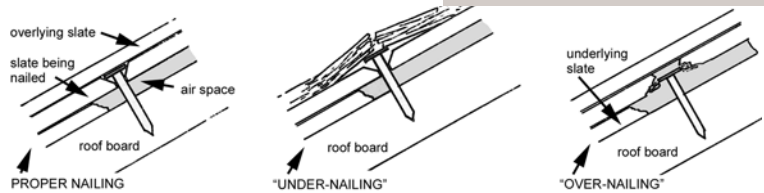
(above): A good slater has no problem nailing slates correctly. When properly nailed, the nail head just sits down inside the slate. When undernailed, the protruding nail head can damage the overlying slate over time. When overnailed, the slate being nailed will crack, break, or cock awkwardly on the roof.
